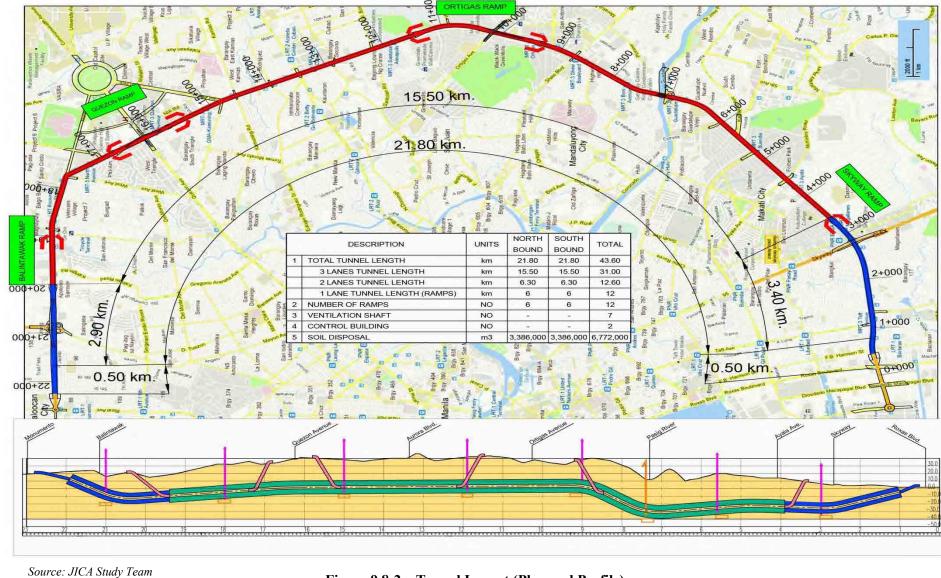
Tunnel Layout (Plan and Profile)
